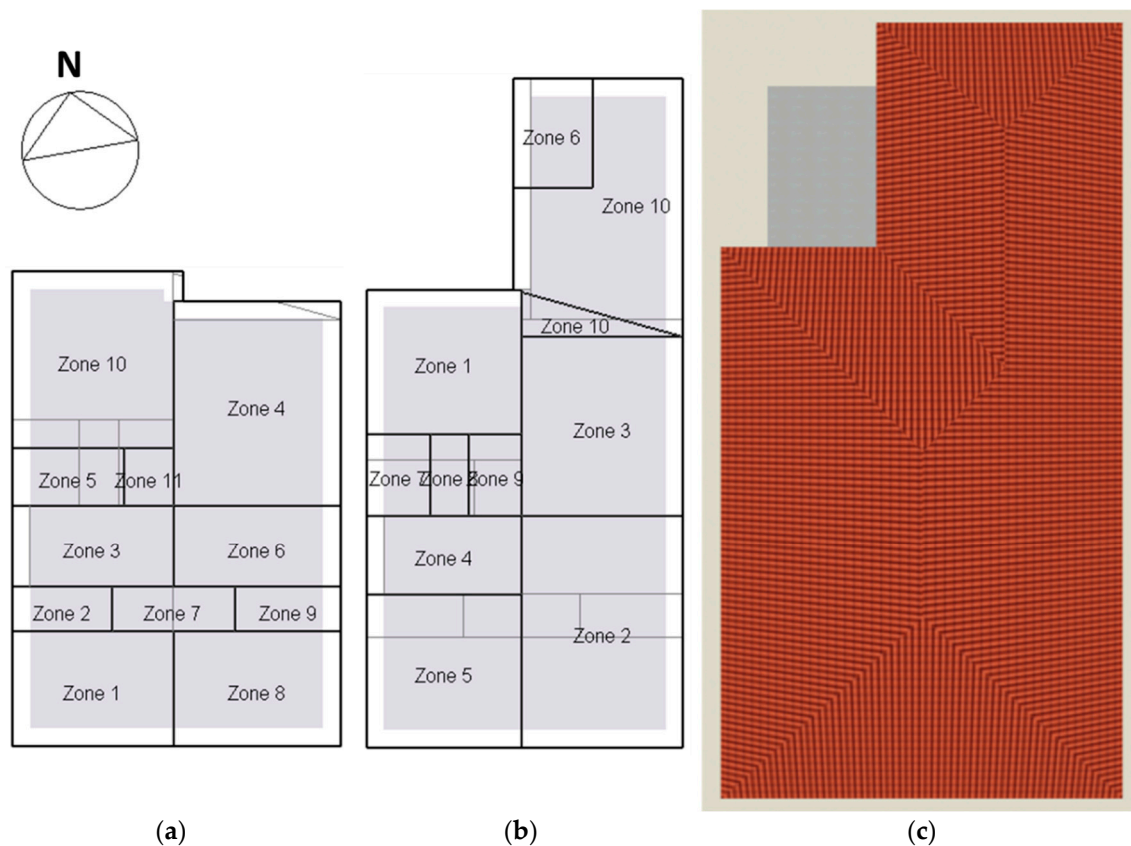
Floor plans of the modeled building, including geographic orientation and room layout: (a) floor 0 (ground); (b) floor 1; (c) roof. The main façade of the building is oriented toward SSE (170°).
